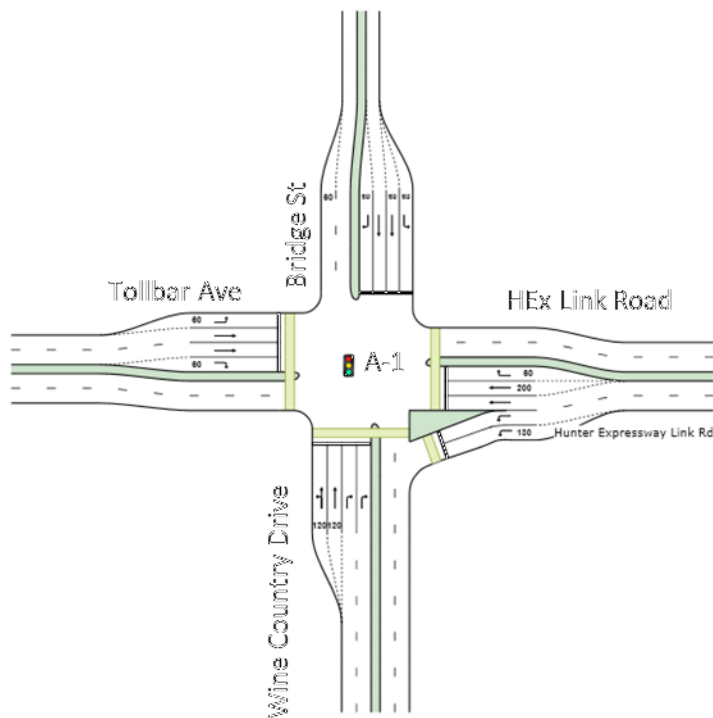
Proposed upgrade at Wine Country Drive / Bridge Street / Tollbar Avenue
